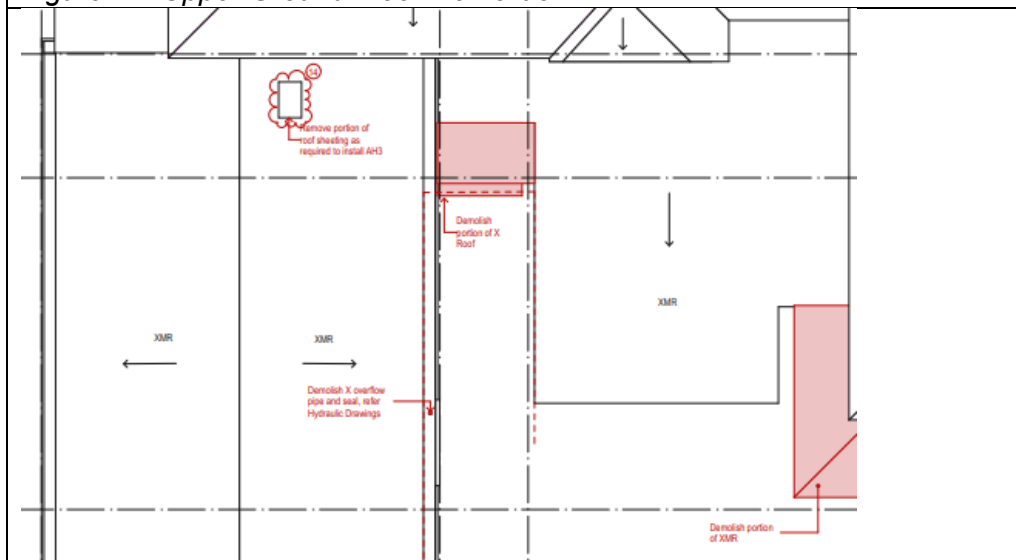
Demolition: Roof (Remove portion of roof sheeting as required)
